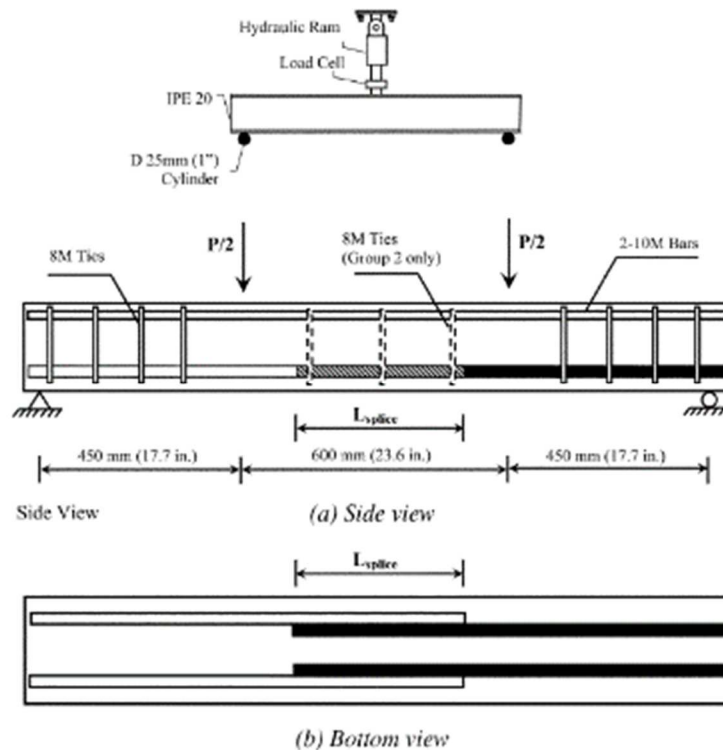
Longitudinal reinforcement and loading details of specimens tested by (Bashandy, 2009)
